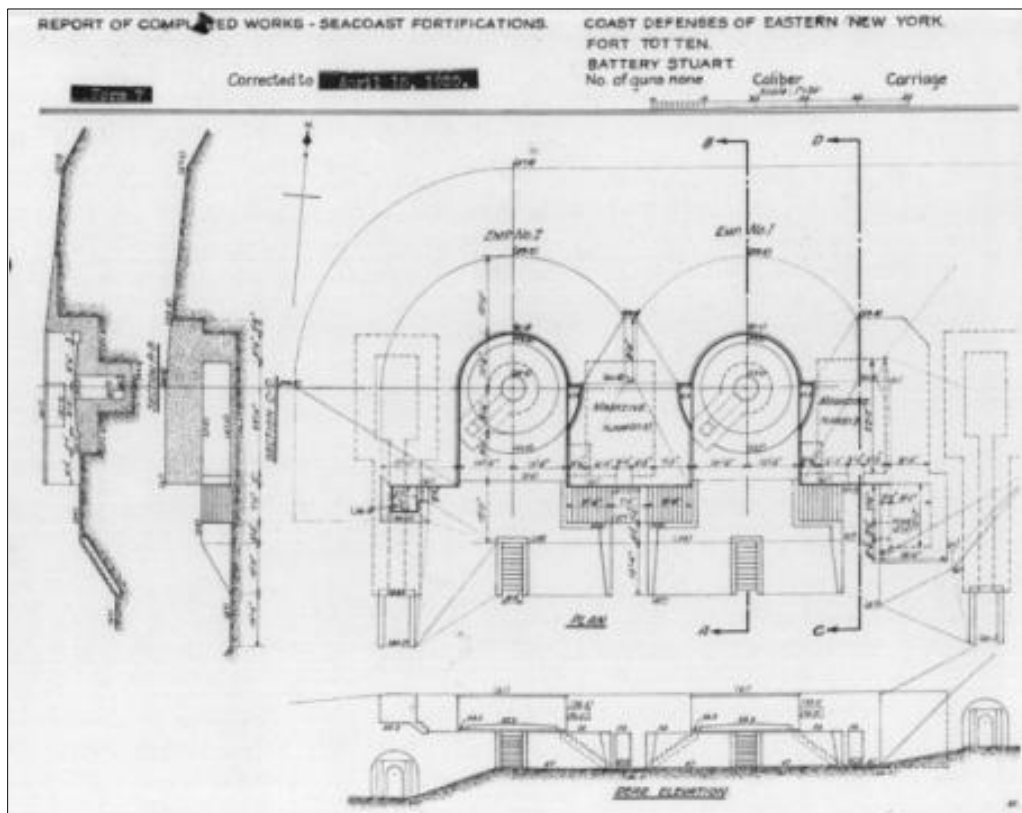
Plan, Sections and Elevation of Battery Stuart, built 1898-1900 (NARA, 1920, Report of Completed Works)
